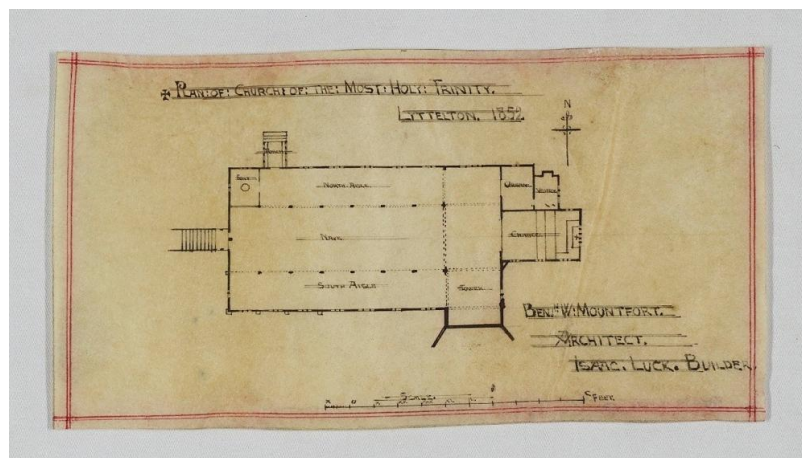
This plan was found in the bottle laid in the foundation stone, which was located when repairs were undertaken on the church. PAR039-LYHT-P3 — Image by: Christchurch Anglican Diocesan Archives
